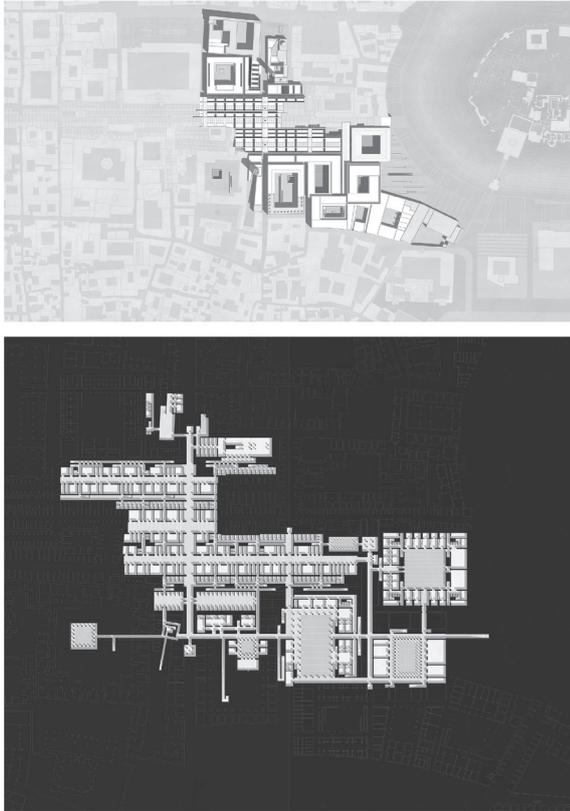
Project for the reconstruction of Aleppo's Souk, master thesis by Stefano Davolio, roof plan and underground level, 2019.
